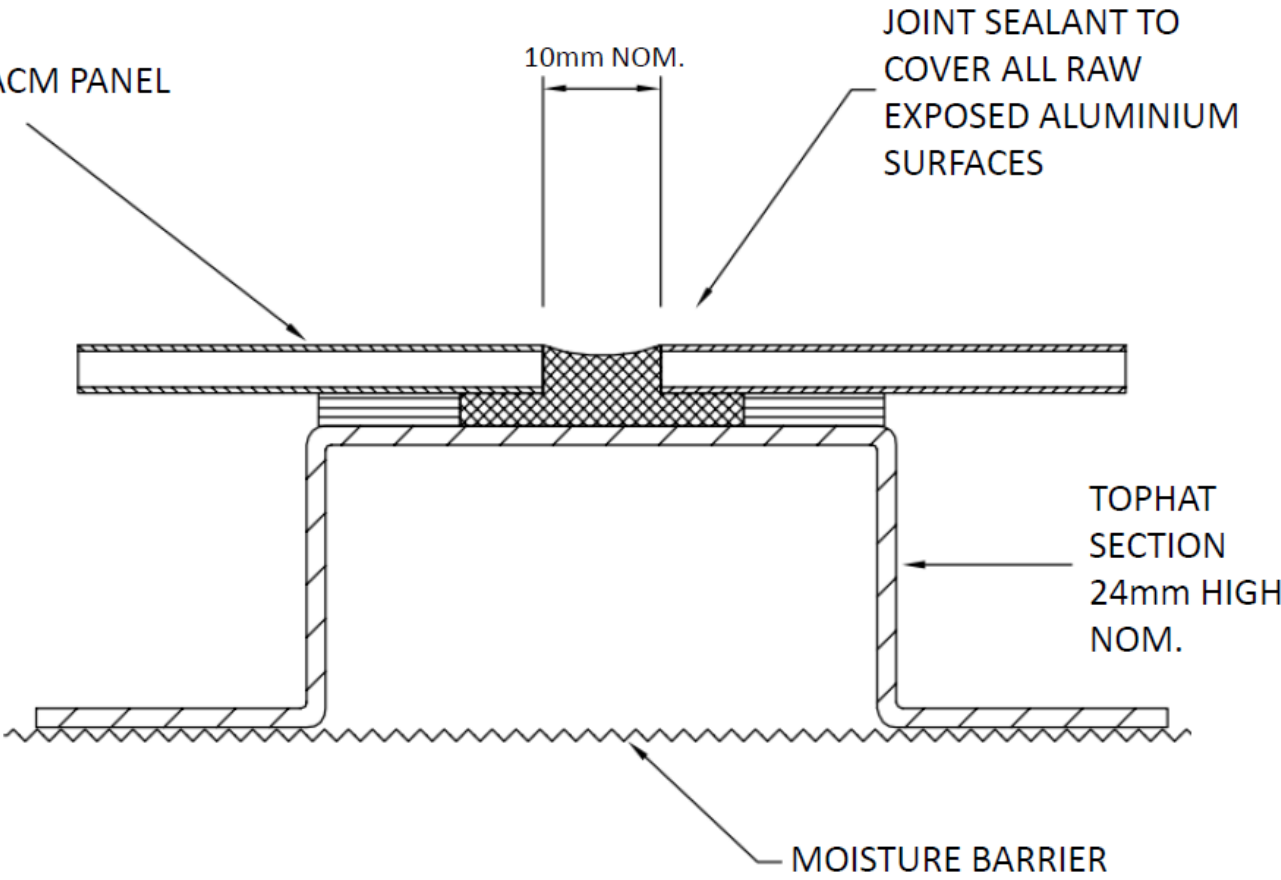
Aluminium/Polyethylene Composite Panel Facade - External Wall Cladding
